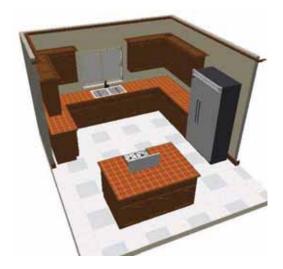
Three Dimensional Drawing- Island Shape Kitchen Layout Image: Phelix Kirk
